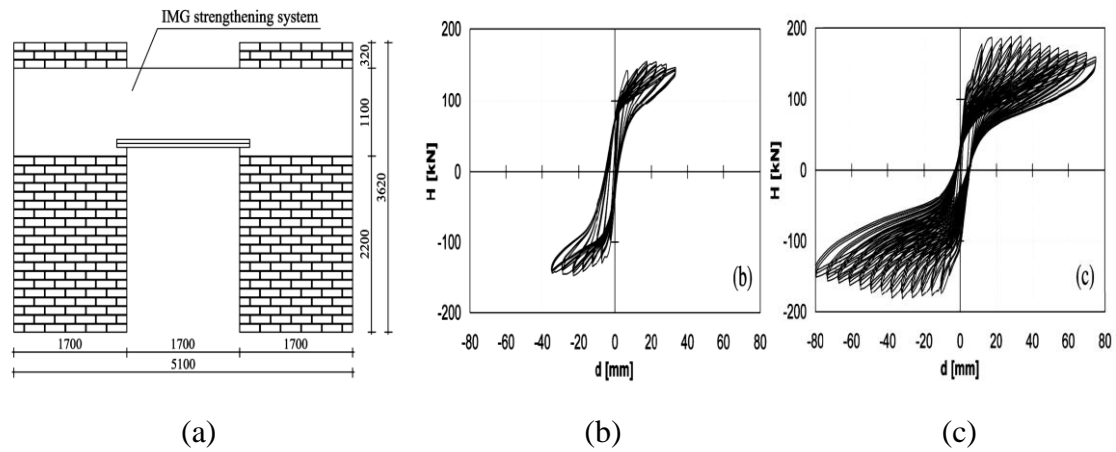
(a) Strengthening scheme of the masonry wall with door opening, (b) Experimental force-displacement curve of the unretrofitted infill wall, and (c) of the retrofitted infill wall (Augenti et al. 2010).
